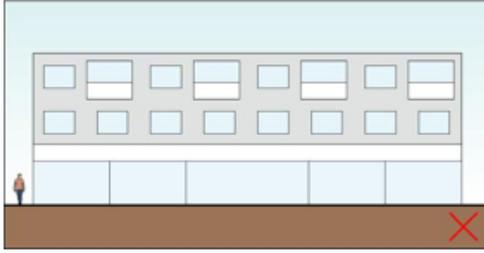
How not to do it: the ground floor and upper floors do not relate to one another architecturally
